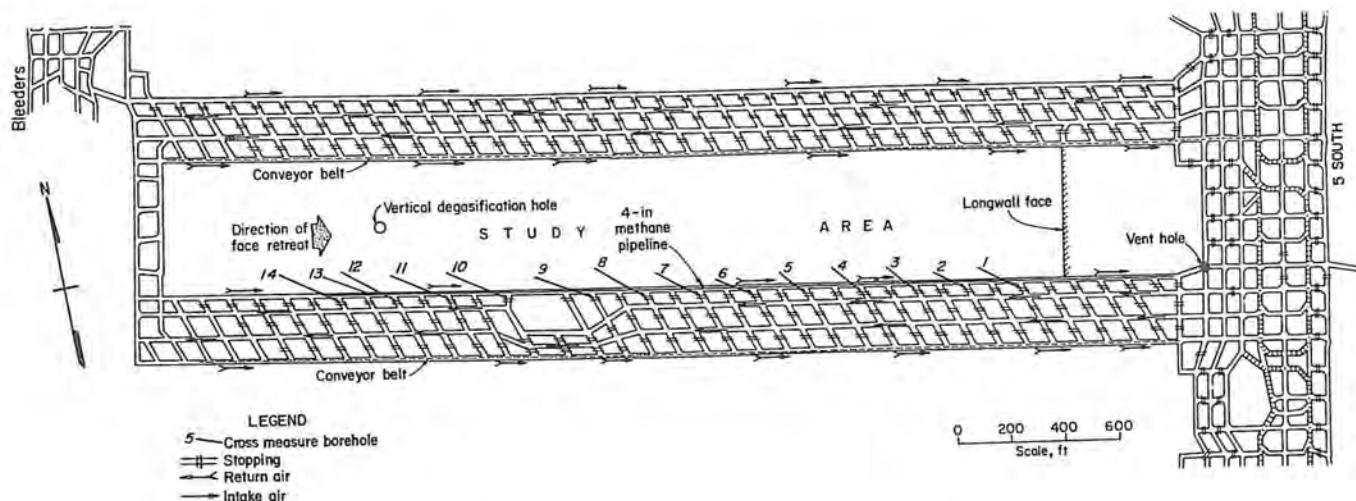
Longwall test panel in Pittsburgh Coalbed.
